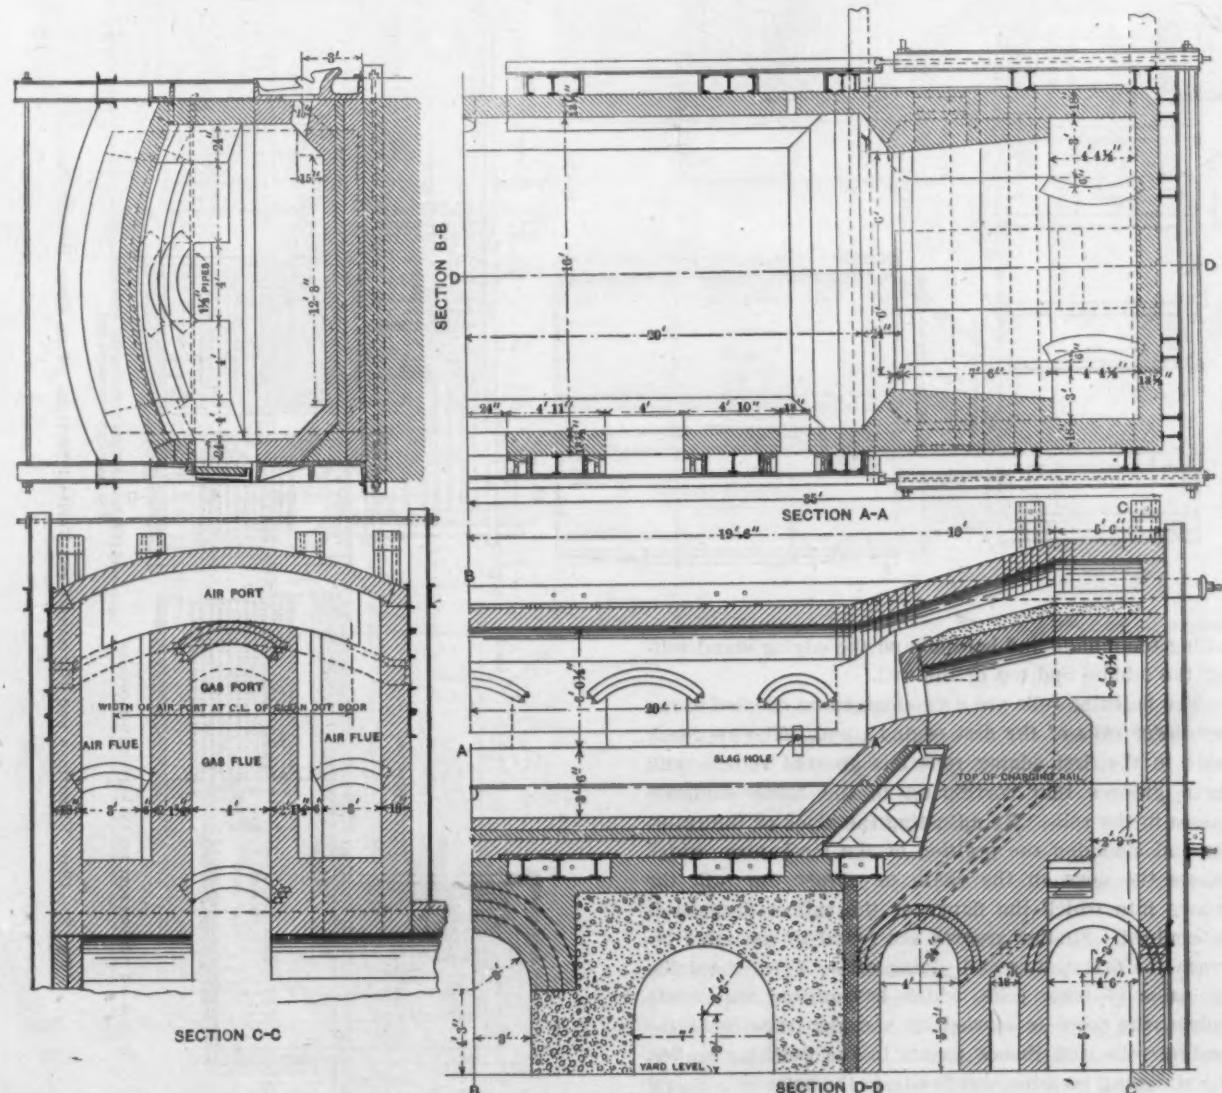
Sections Through the Hearth and Parts of an Open Hearth Furnace.
